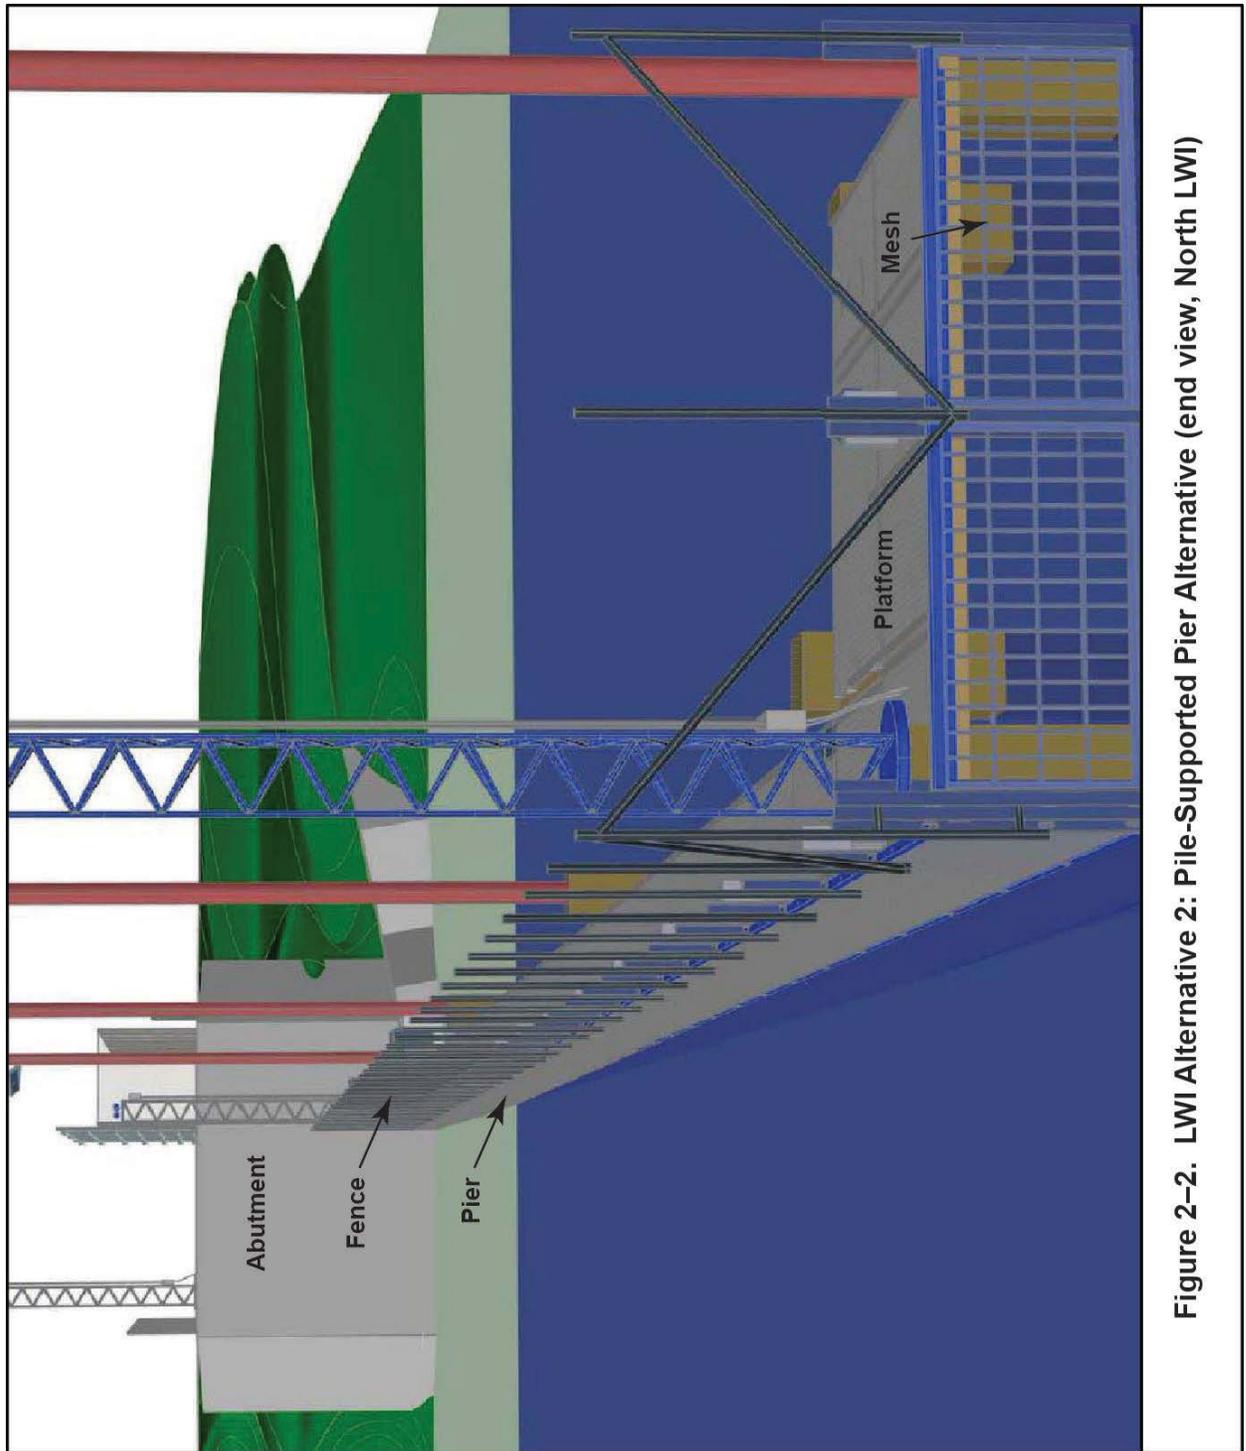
LWI Alternative 2: Pile-Supported Pier Alternative (end view, North LWI)
